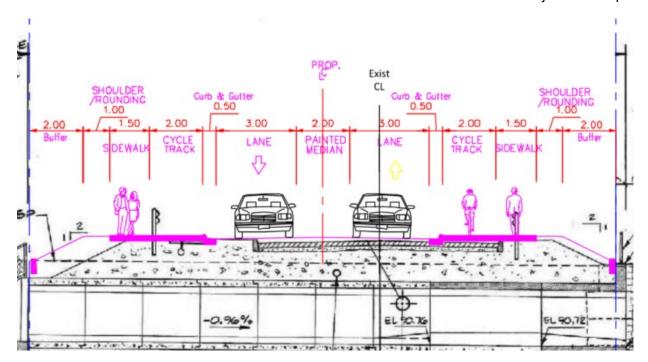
Preferred Solution - Cross-section at Turtle Creek Culvert
